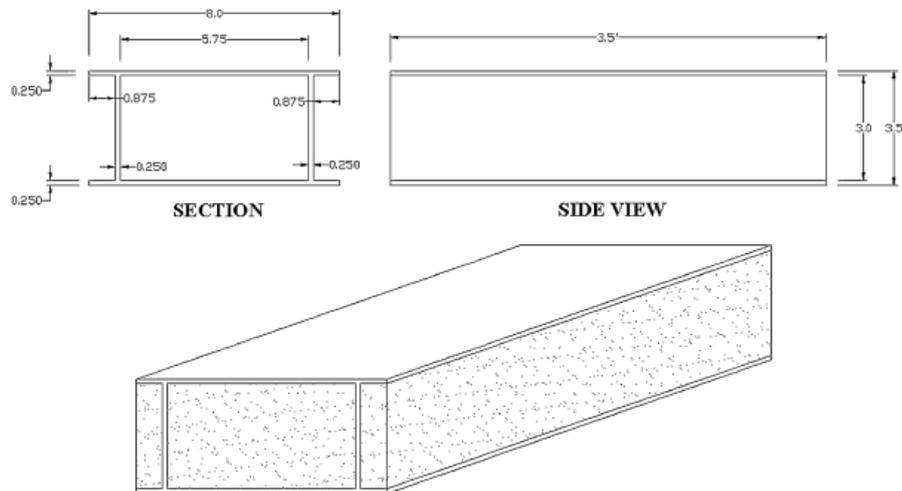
A schematic diagram showing the dimensions of the test beams. Dimensions are shown in inches.
